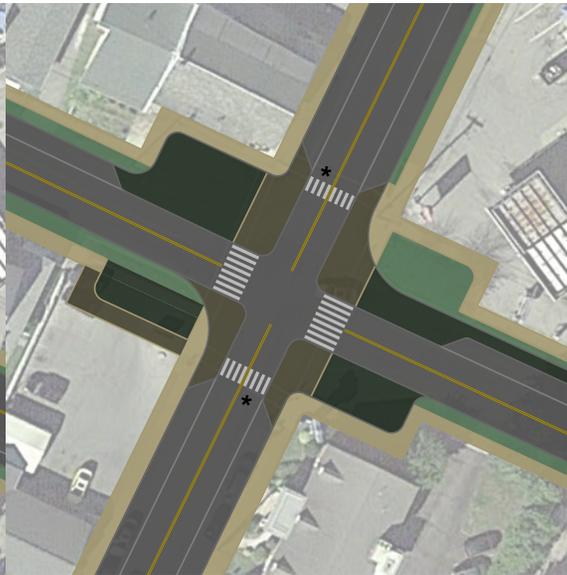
Aerial view of initial intersection redesign showing painted pavement darker
